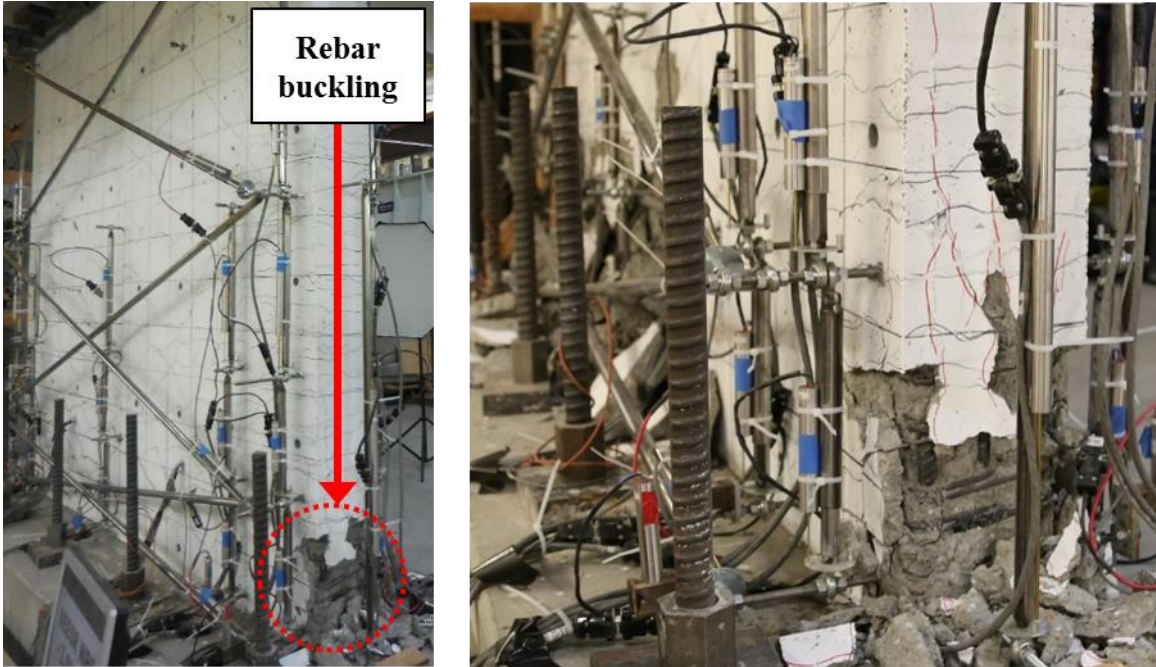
Specimen WP5 damage at west boundary – a) Cover crushing/spalling and buckling of longitudinal reinforcement (+3% rotation); and b) Final damage state at +4% rotation
